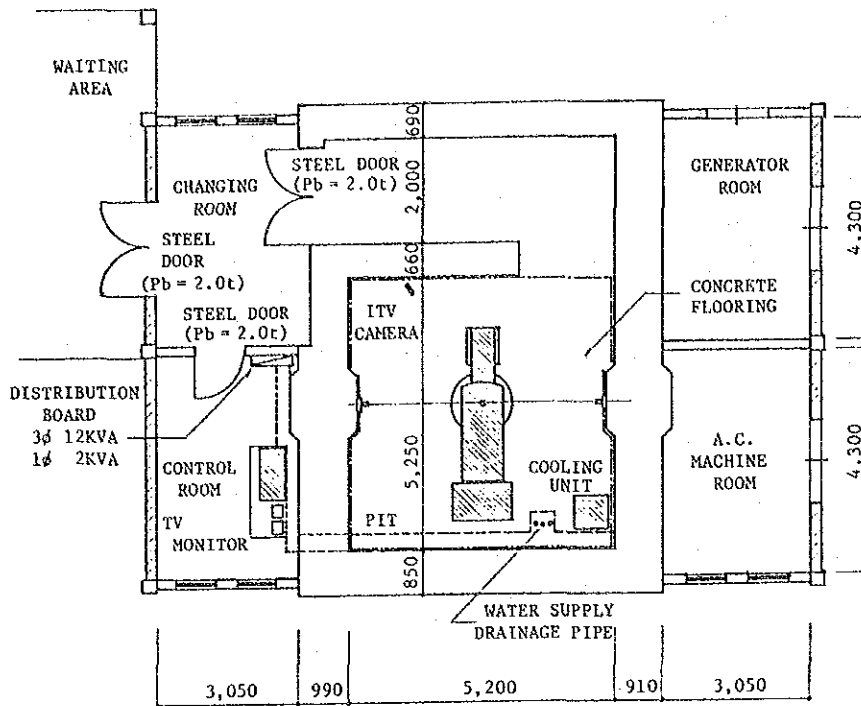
LINEAR-ACCELERATOR INSTALLATION PLAN
